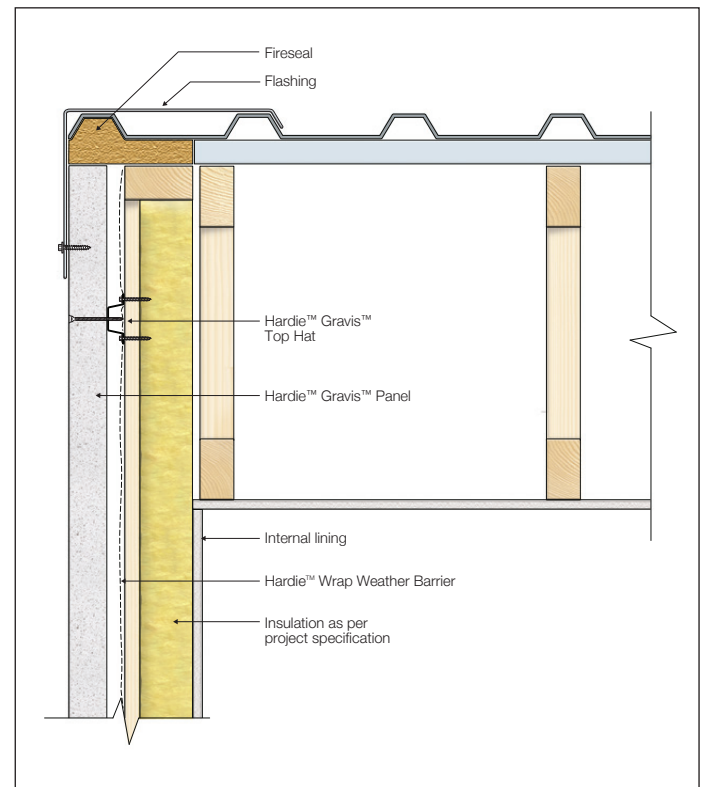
ZERO LOT WALL TO ROOF DETAIL
